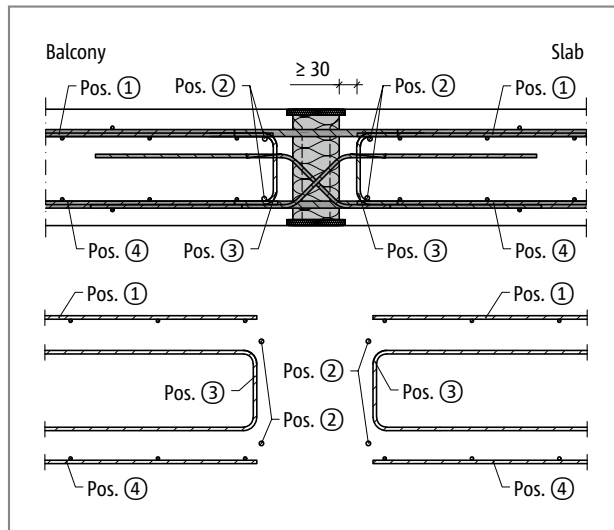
Schöck Isokorb® T type D: On-site reinforcement
